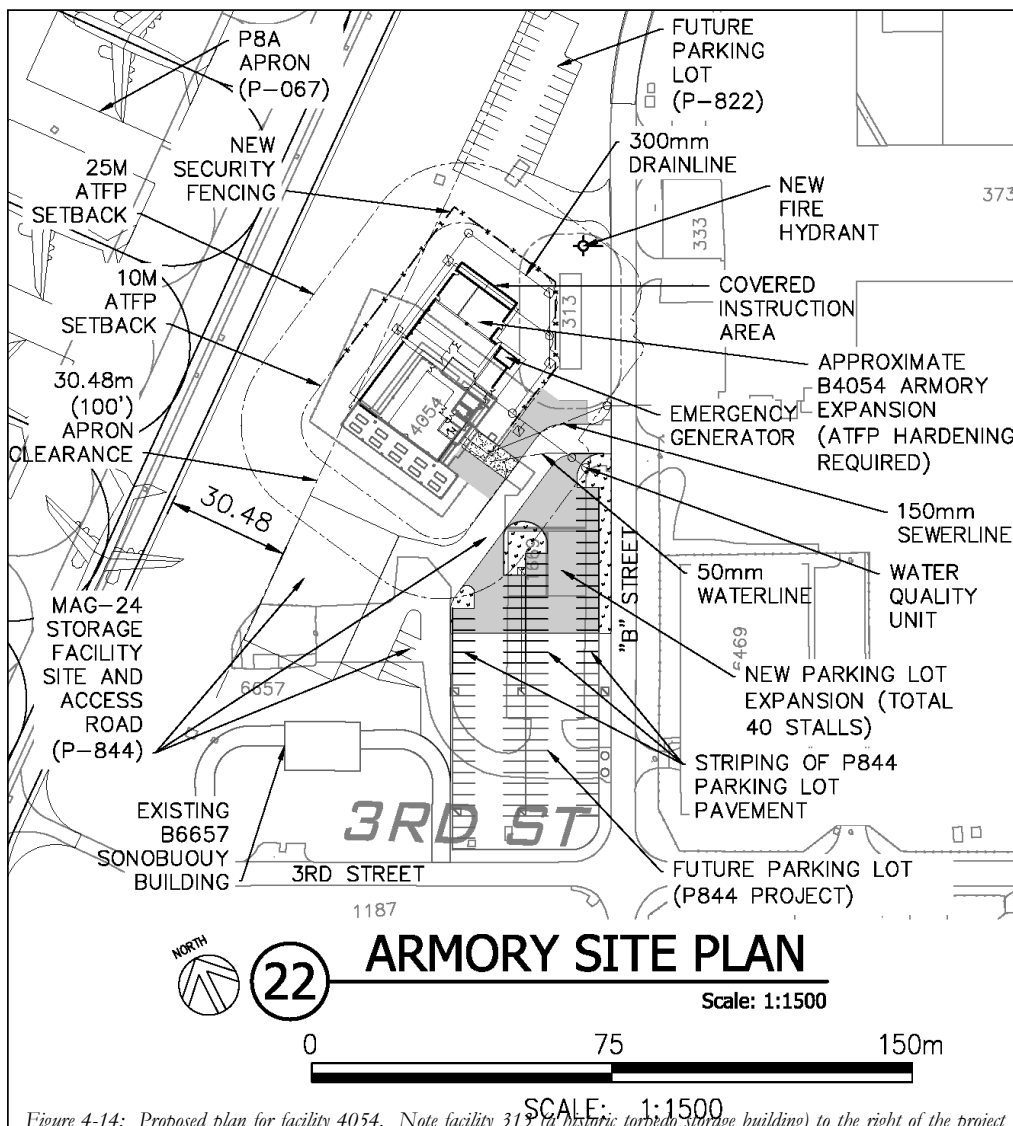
Proposed plan for facility 4054. Note facility 313 (a historic torpedo storage building) to the right of the project site. The facility 4054 additions are configured so that facility 313 remains.
